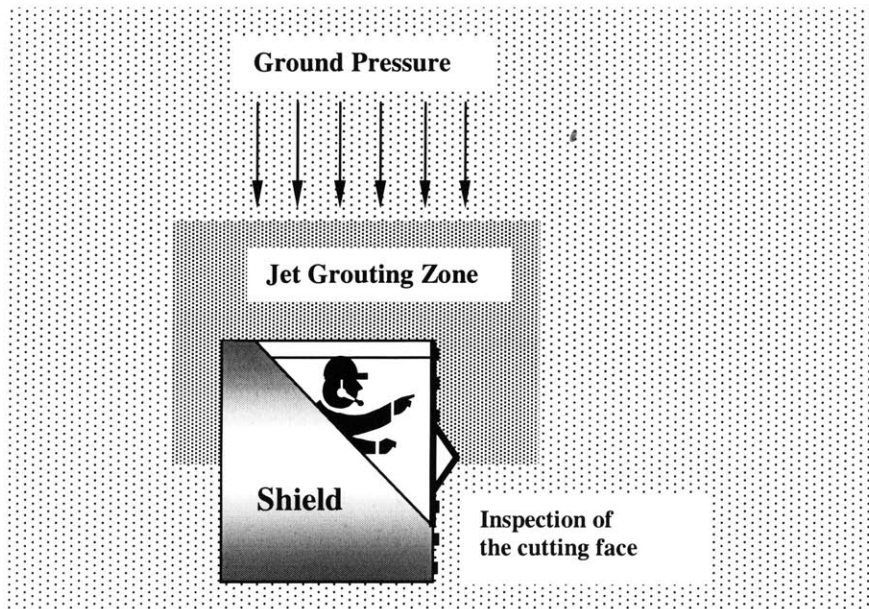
Jet grouting zone providing stability during the inspection of the shield's cutting face
